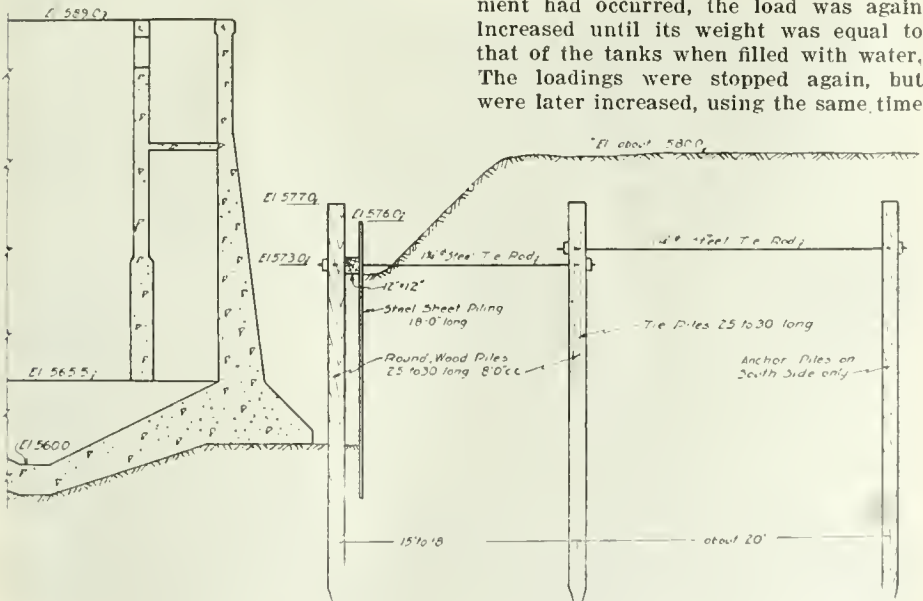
COFFERDAM CONSTRUCTION, WESTERLY SEWAGE TREATMENT WORKS, CLEVELAND, OHIO, SHOWING TYPICAL SECTION THROUGH TANKS AND COFFERDAM.
